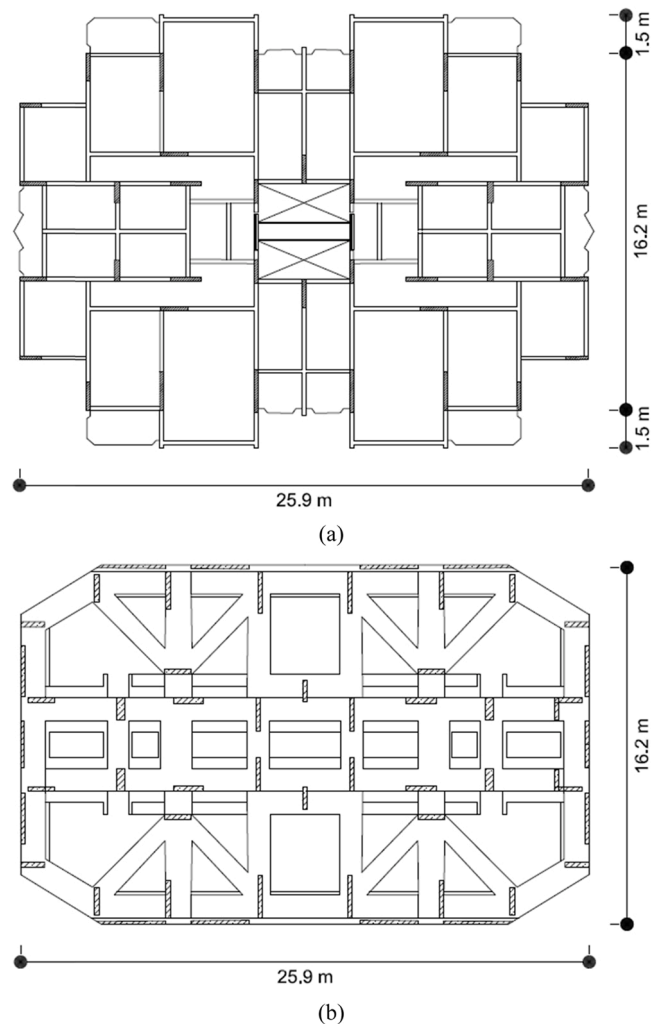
Typical floor (a) and strip foundation (b) plans of Building A.
